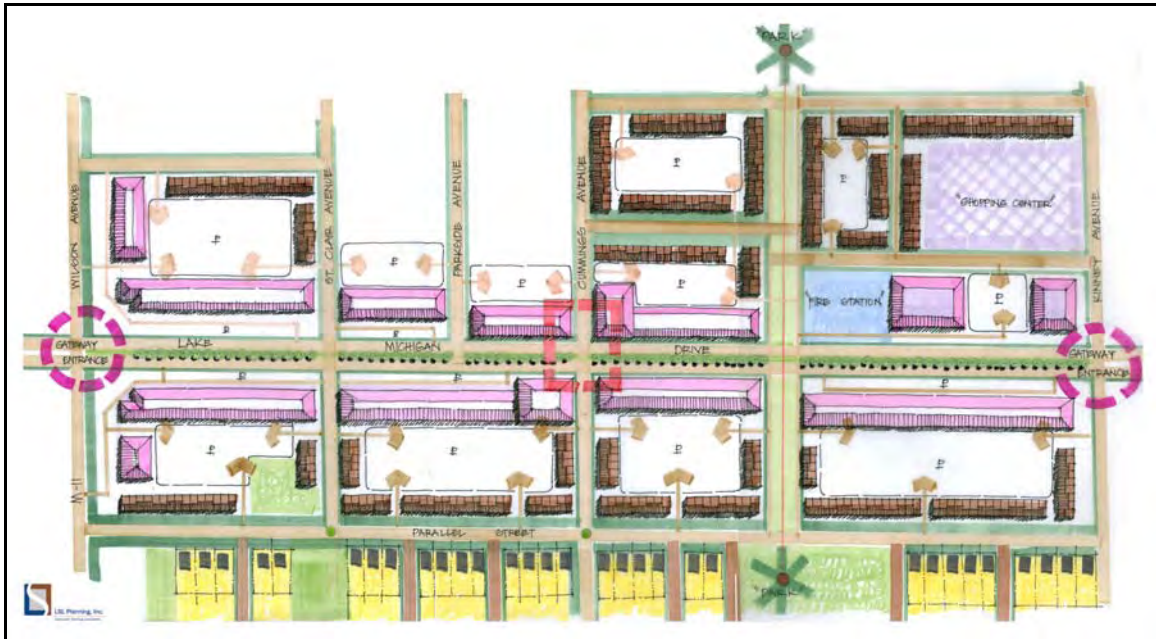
Lake Michigan Drive Corridor – Detailed Plan For “Downtown Walker”
